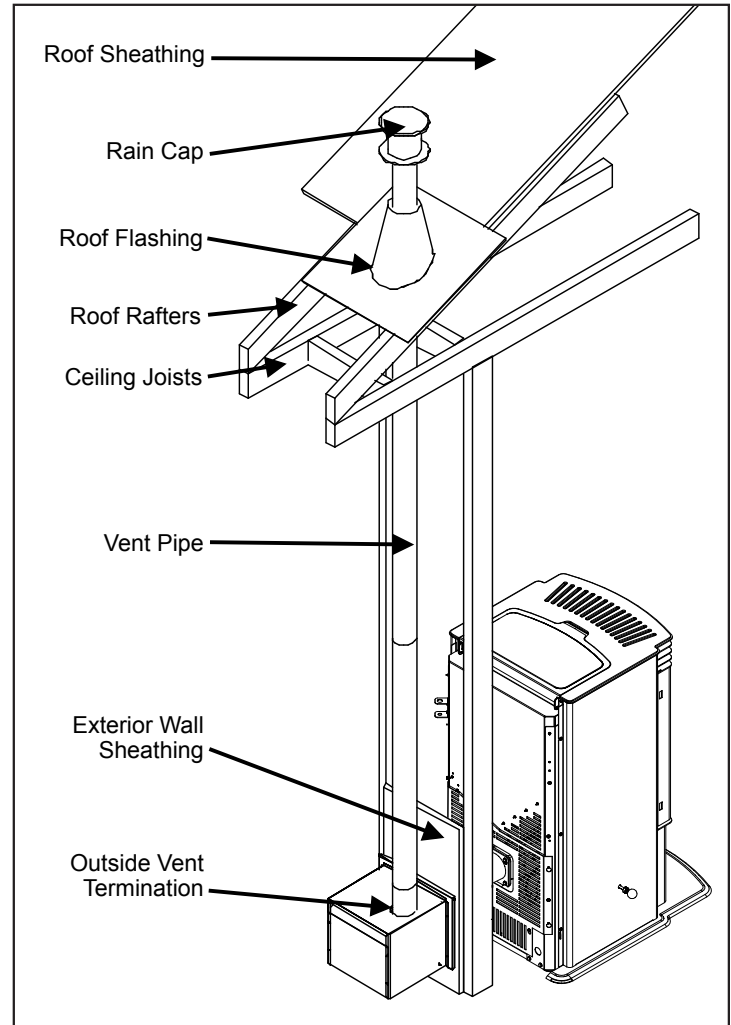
Through Wall Installation with Exterior Blower Kit; Vertical Termination.
